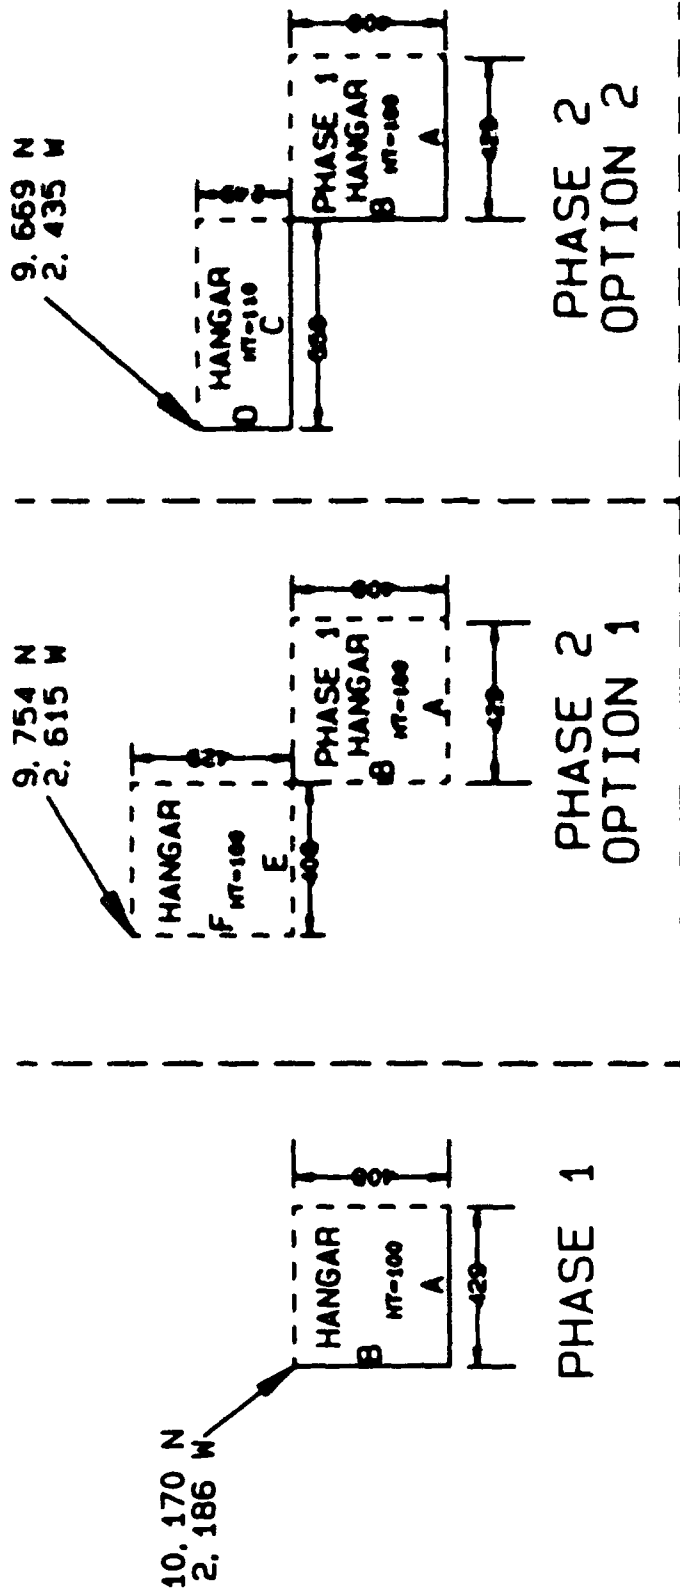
DALLAS-FORT WORTH RUNWAY 18R, ILS MATH MODELING LAYOUT
